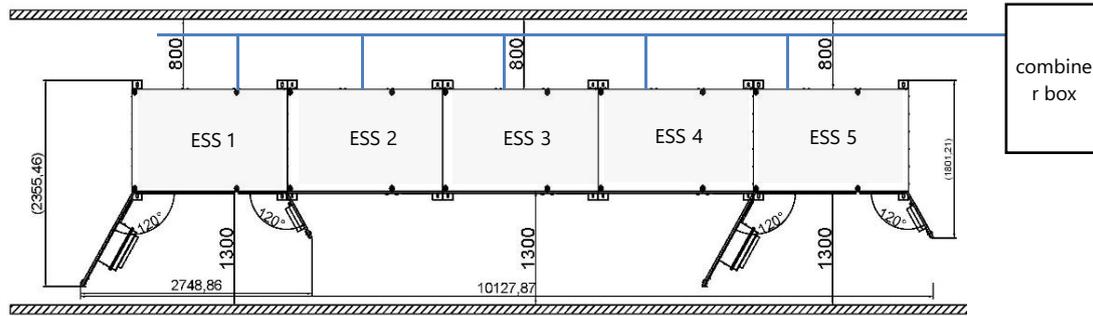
BESS parallel installation space requirements (off-grid scheme)
